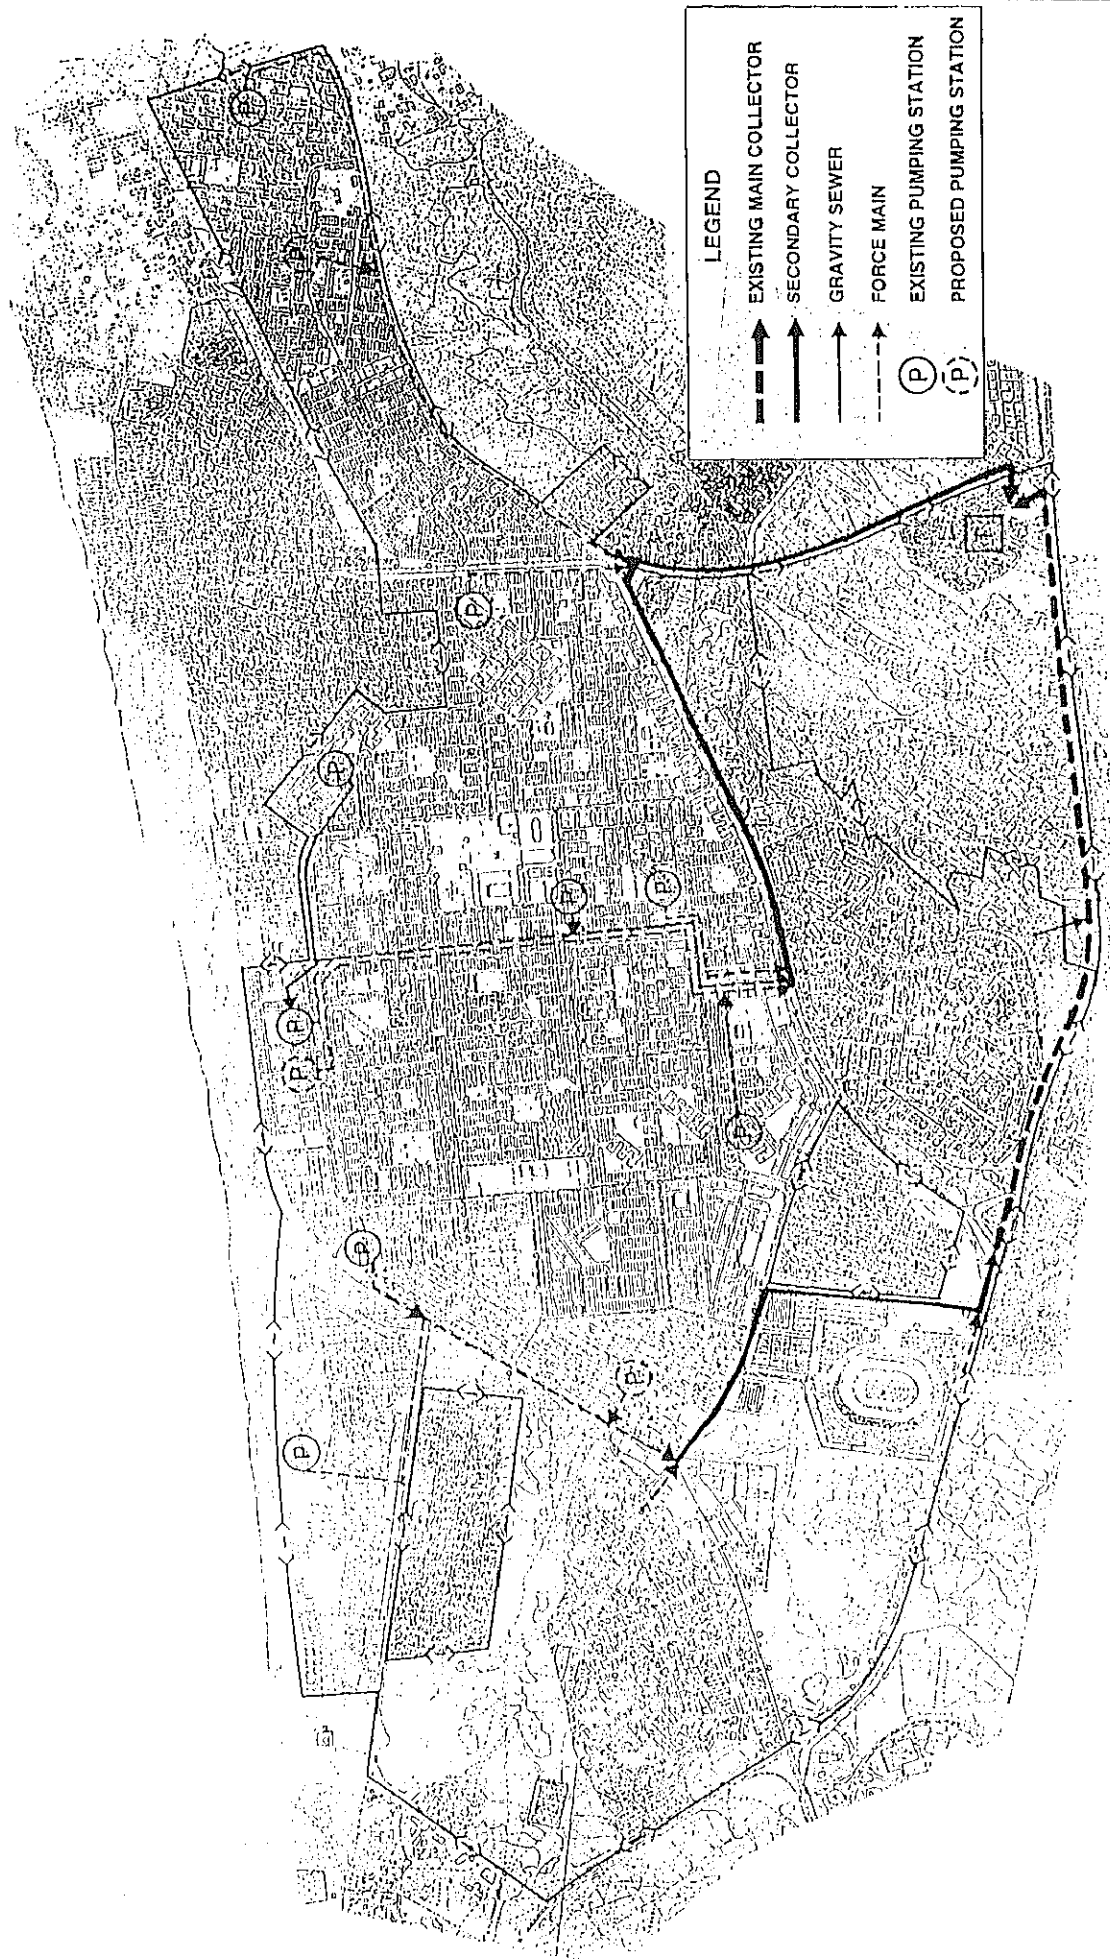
PROPOSED FACILITY PLAN FOR THE PRIORITY PROJECT
